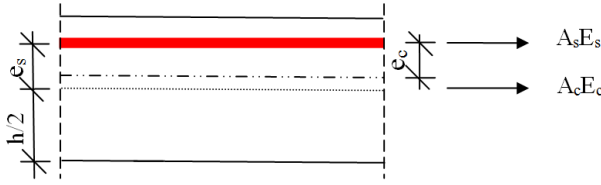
Determination of centre of gravity of composed (concrete-steel) cross section
